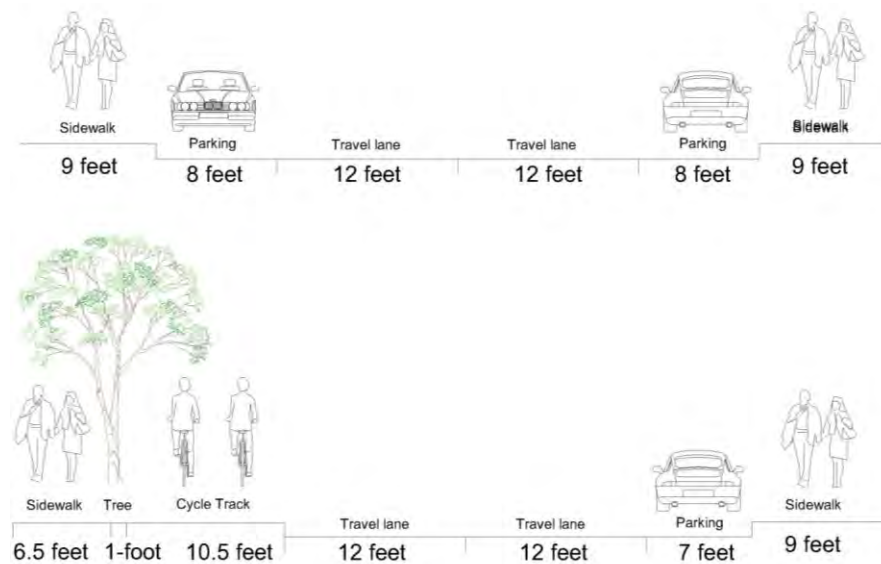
Existing and proposed cross-sections for a Dog-Leg Block on Washington Street
